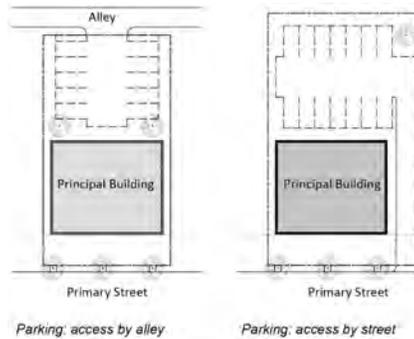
Parking Entrances Shall Not be Situated Adjacent to Primary Streets
